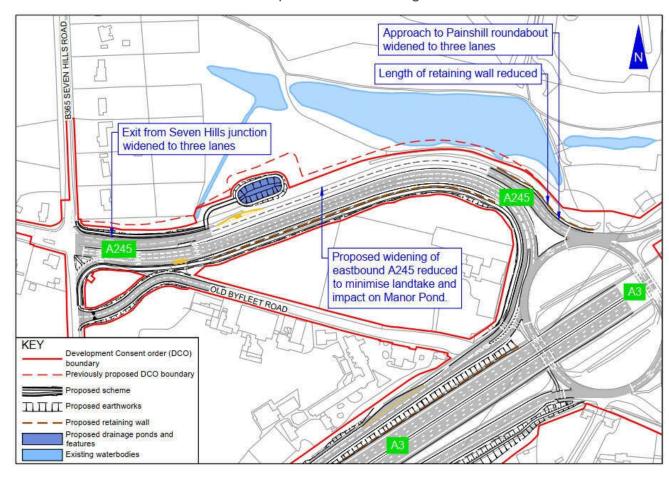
Revised Layout of A245 Eastbound Carriageway
